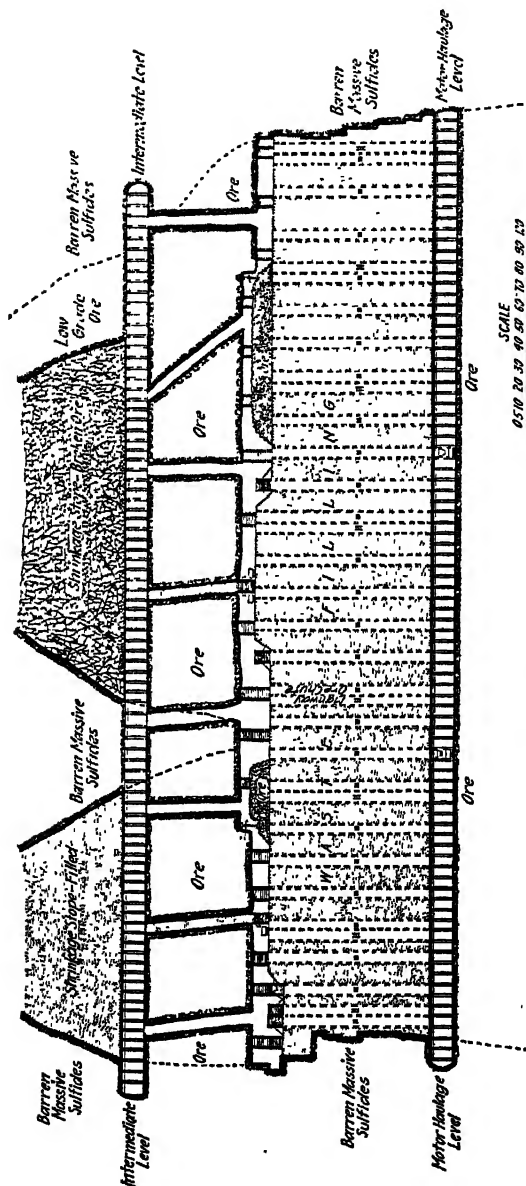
LONGITUDINAL SECTION, HORIZONTAL OUT-AND-FILL STOPS.
